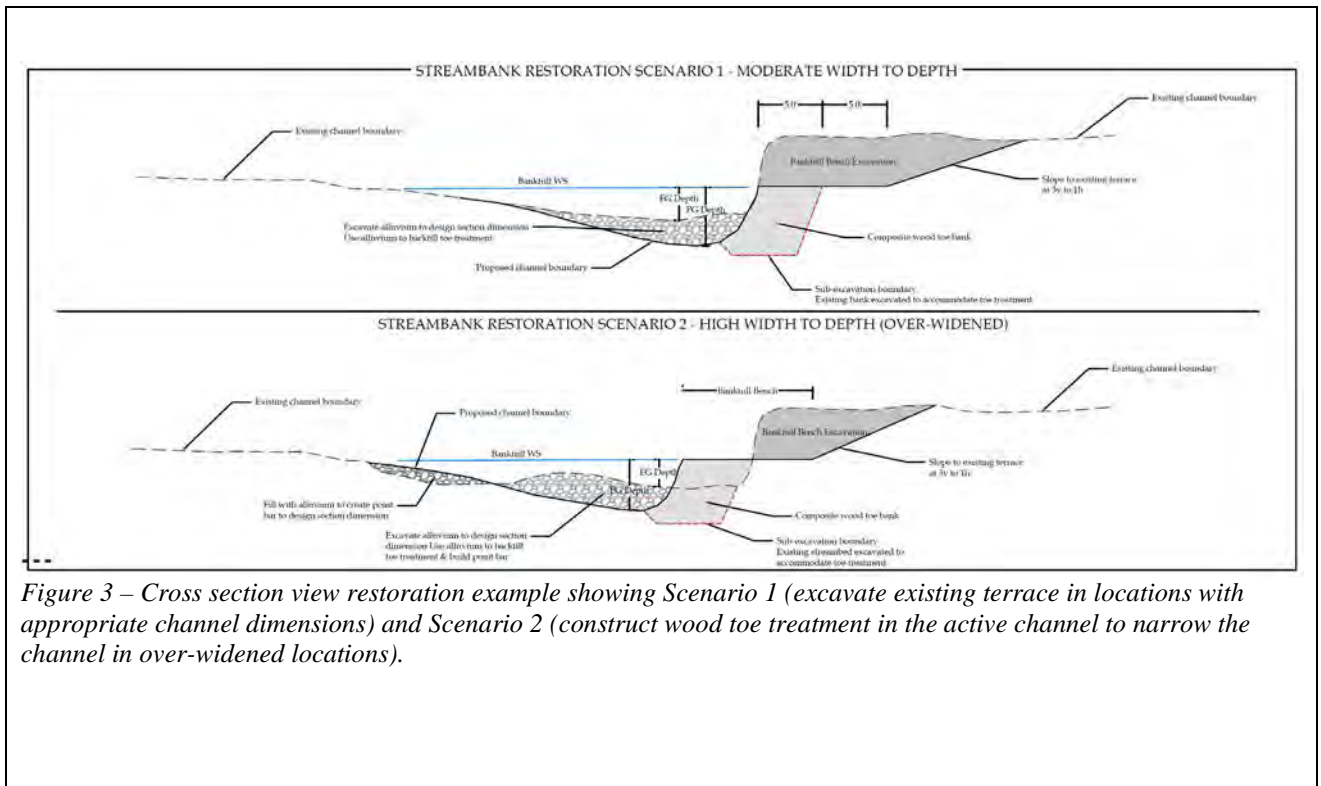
Cross section view restoration example showing Scenario 1 (excavate existing terrace in locations with appropriate channel dimensions) and Scenario 2 (construct wood toe treatment in the active channel to narrow the channel in over-widened locations).
